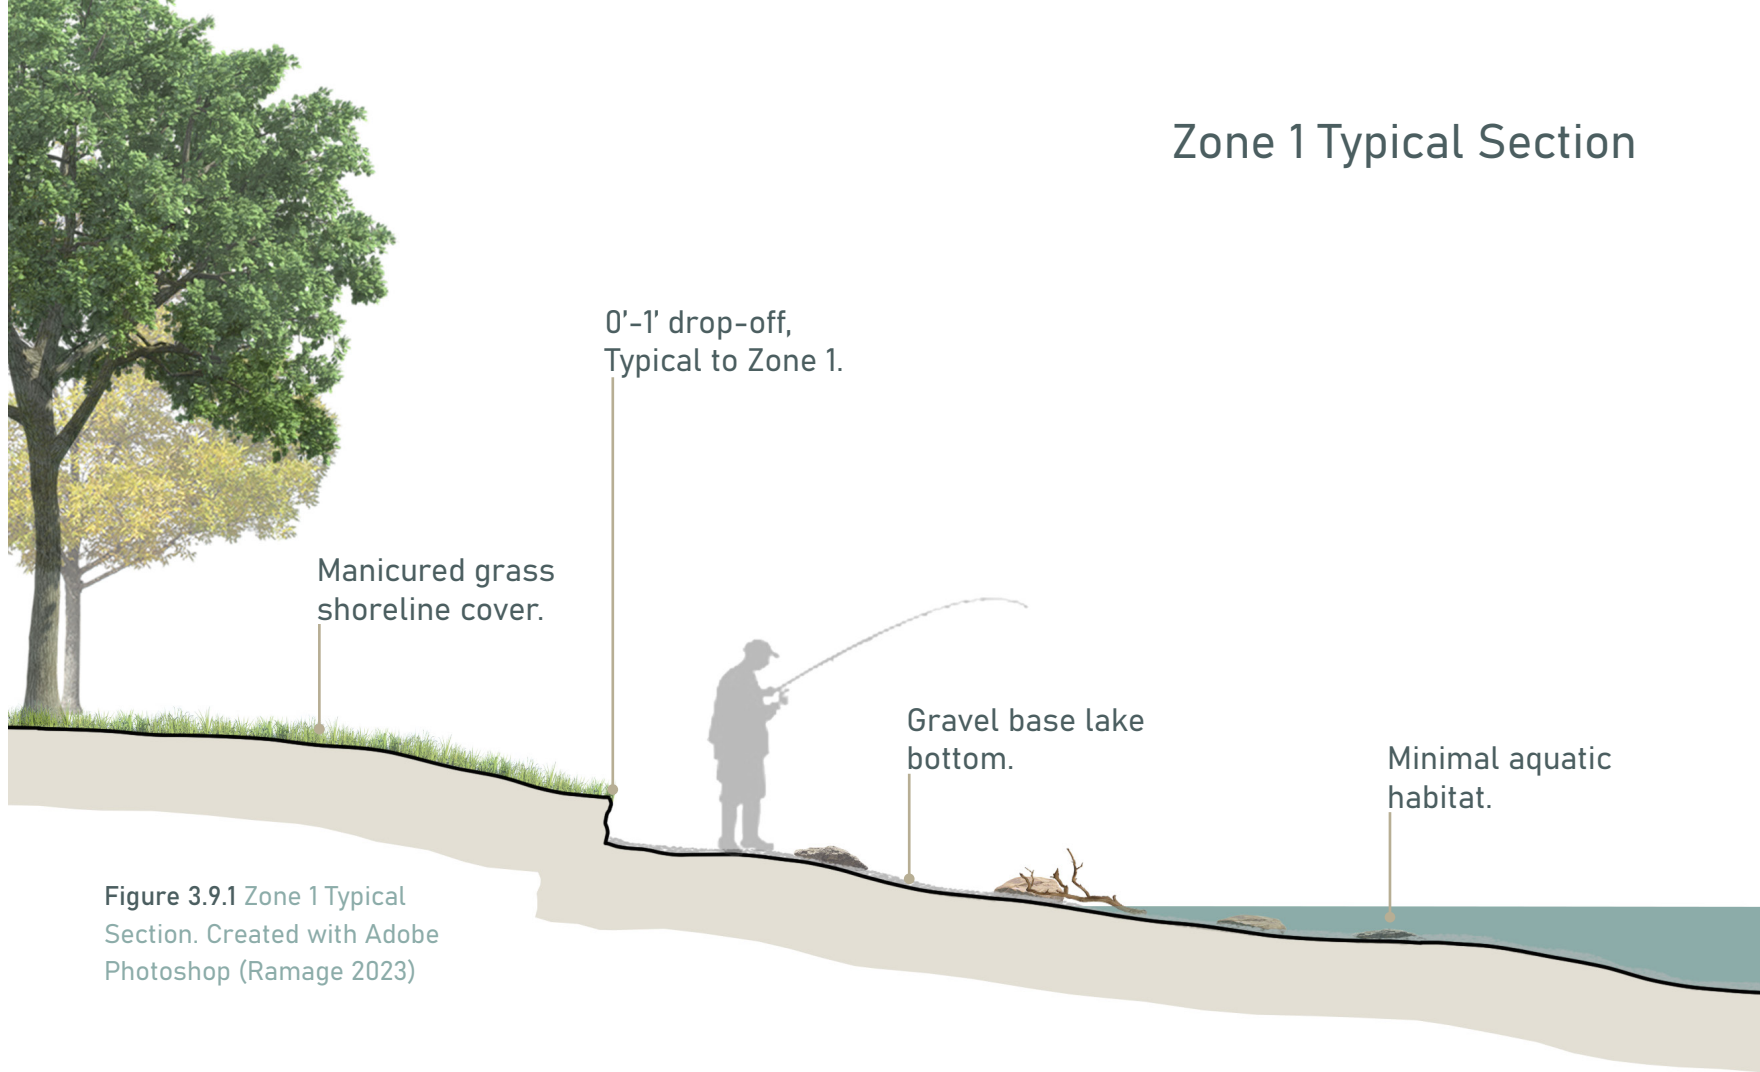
Zone 1 Typical Section. Created with Adobe Photoshop (Ramage 2023)
